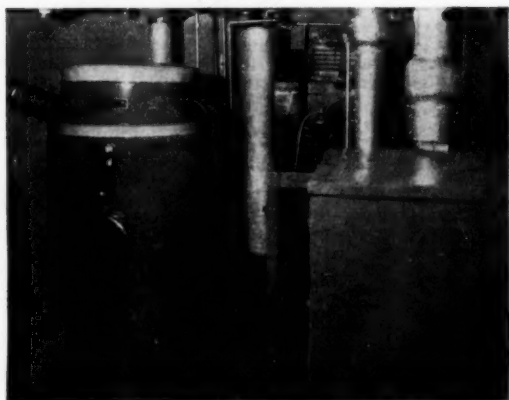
MACHINE ROOM, WITH OIL FURNACE AND REFRIGERATING UNITS
